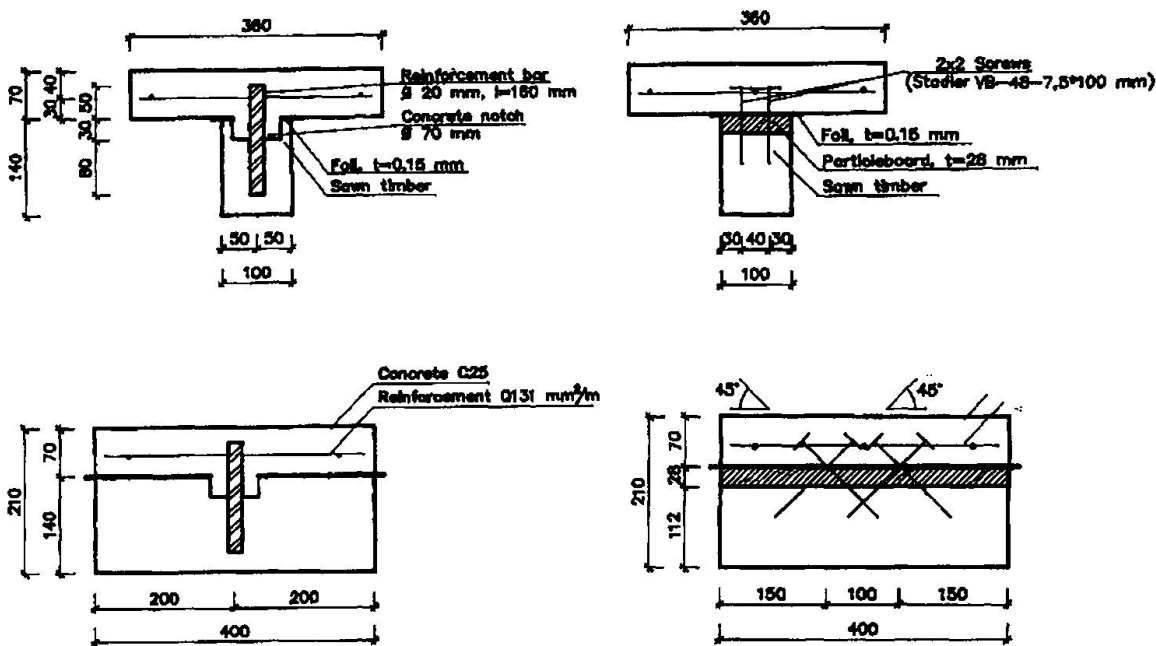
Two fastener types: reinforcement bar with concrete dowel and screws at 45° .
